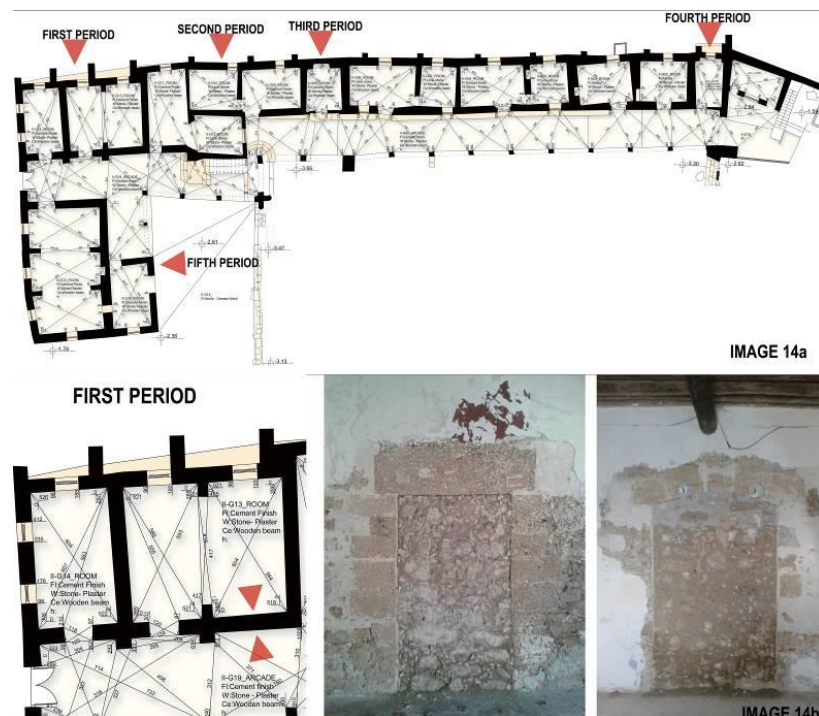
(a) Survey drawing of the north wing building, ground floor plan (b) detailed plan, image of the filled door from first period
